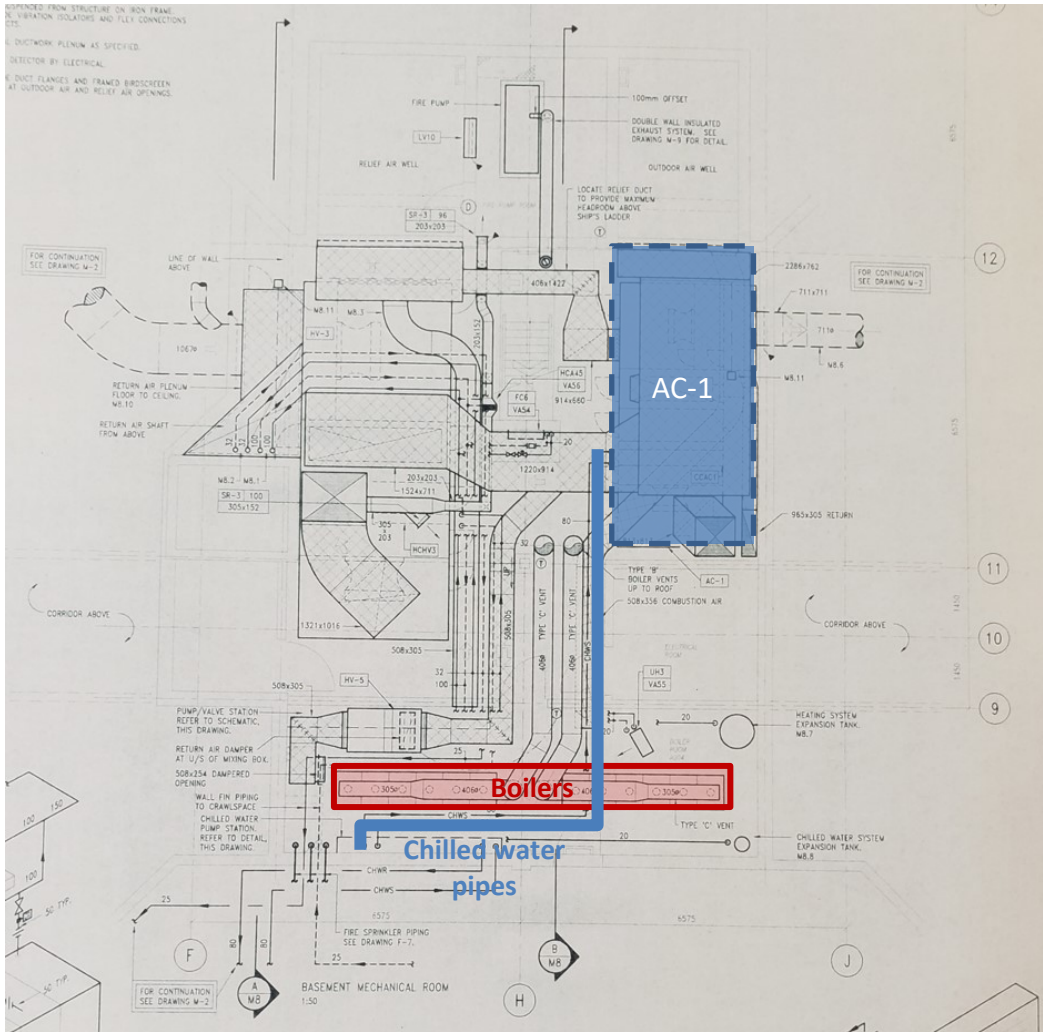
Basement mechanical room. Supply and return pipes from the existing chiller pass close to the boiler plant and heating loop.
